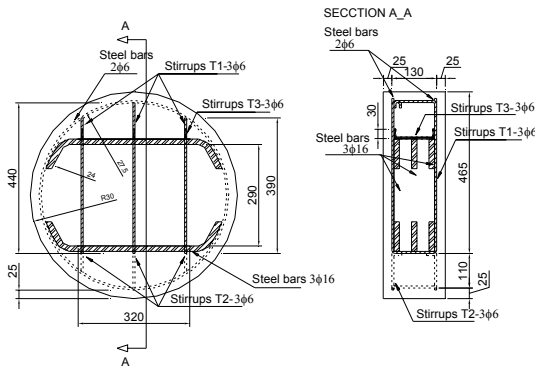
Arrangement of the conventional reinforcement (dimensions in mm).
